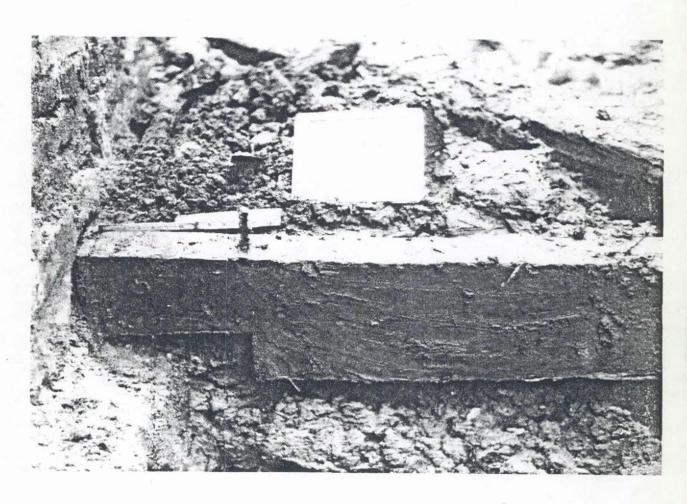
A detail of the wooden floor in Lot 47, showing one of the notched joists supported by the footing stones of the stone foundation wall.
